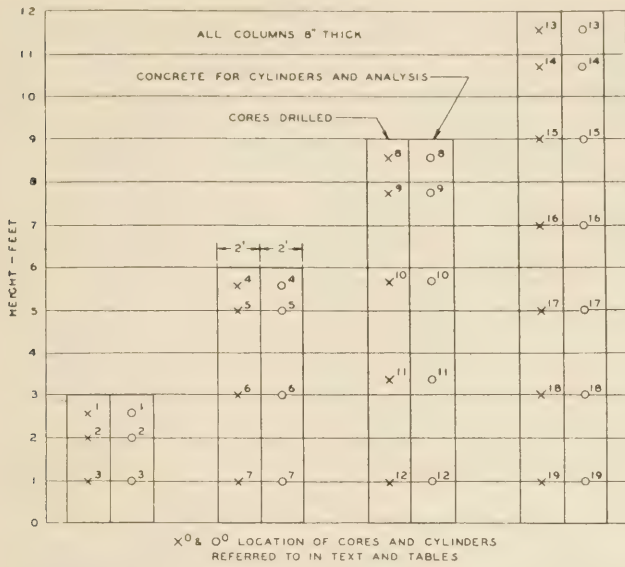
LOCATION OF CONCRETE SPECIMENS TAKEN FROM COLUMNS
